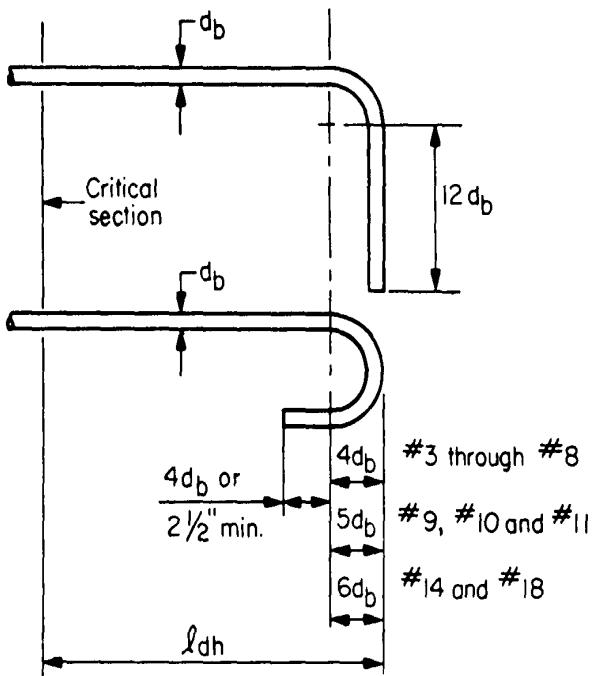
1—Hooked Bar Details for Development of Standard Hooks (ACI Committee 318 2011)
